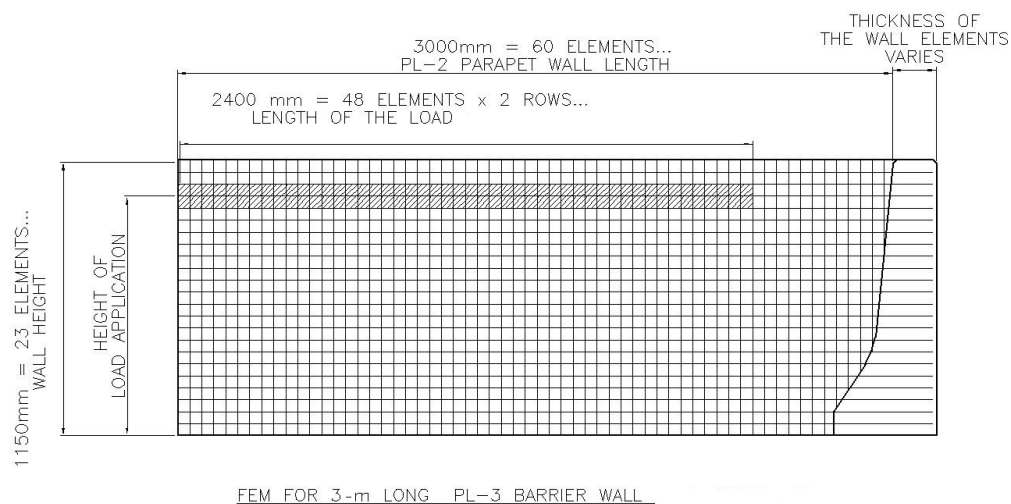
Elevation of PL-3 Barrier Wall FE Model
